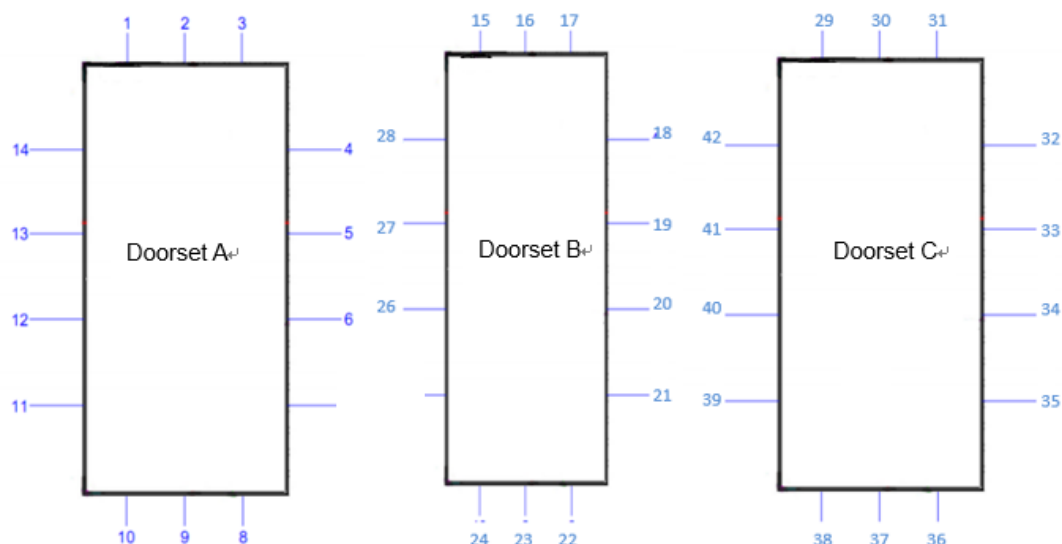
Initial Clearance Measurement Positions (View from unexposed side)
